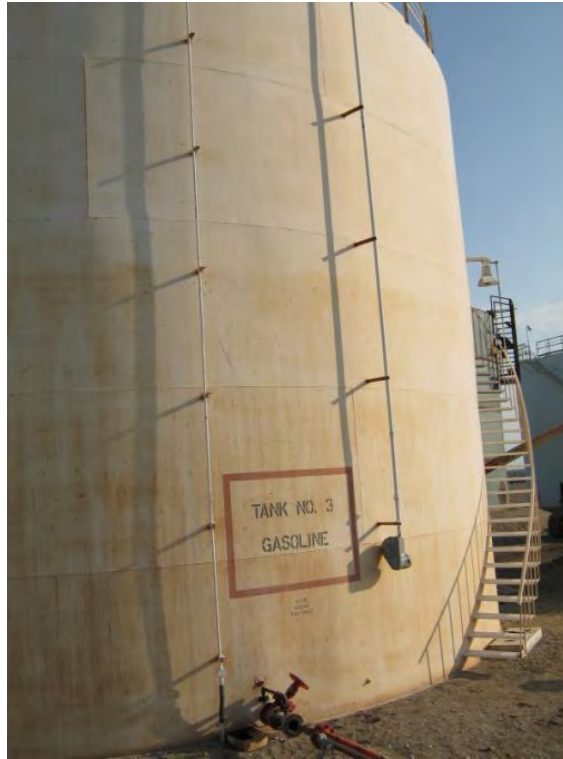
Tank 3 Exterior View – Protective coating worn, light rusting.
